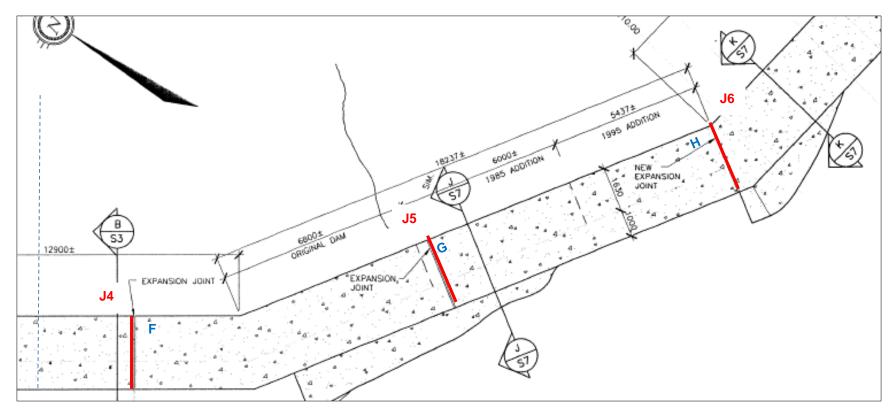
Continuation of plan of joint naming convention (adapted 2006 construction plans S1).
